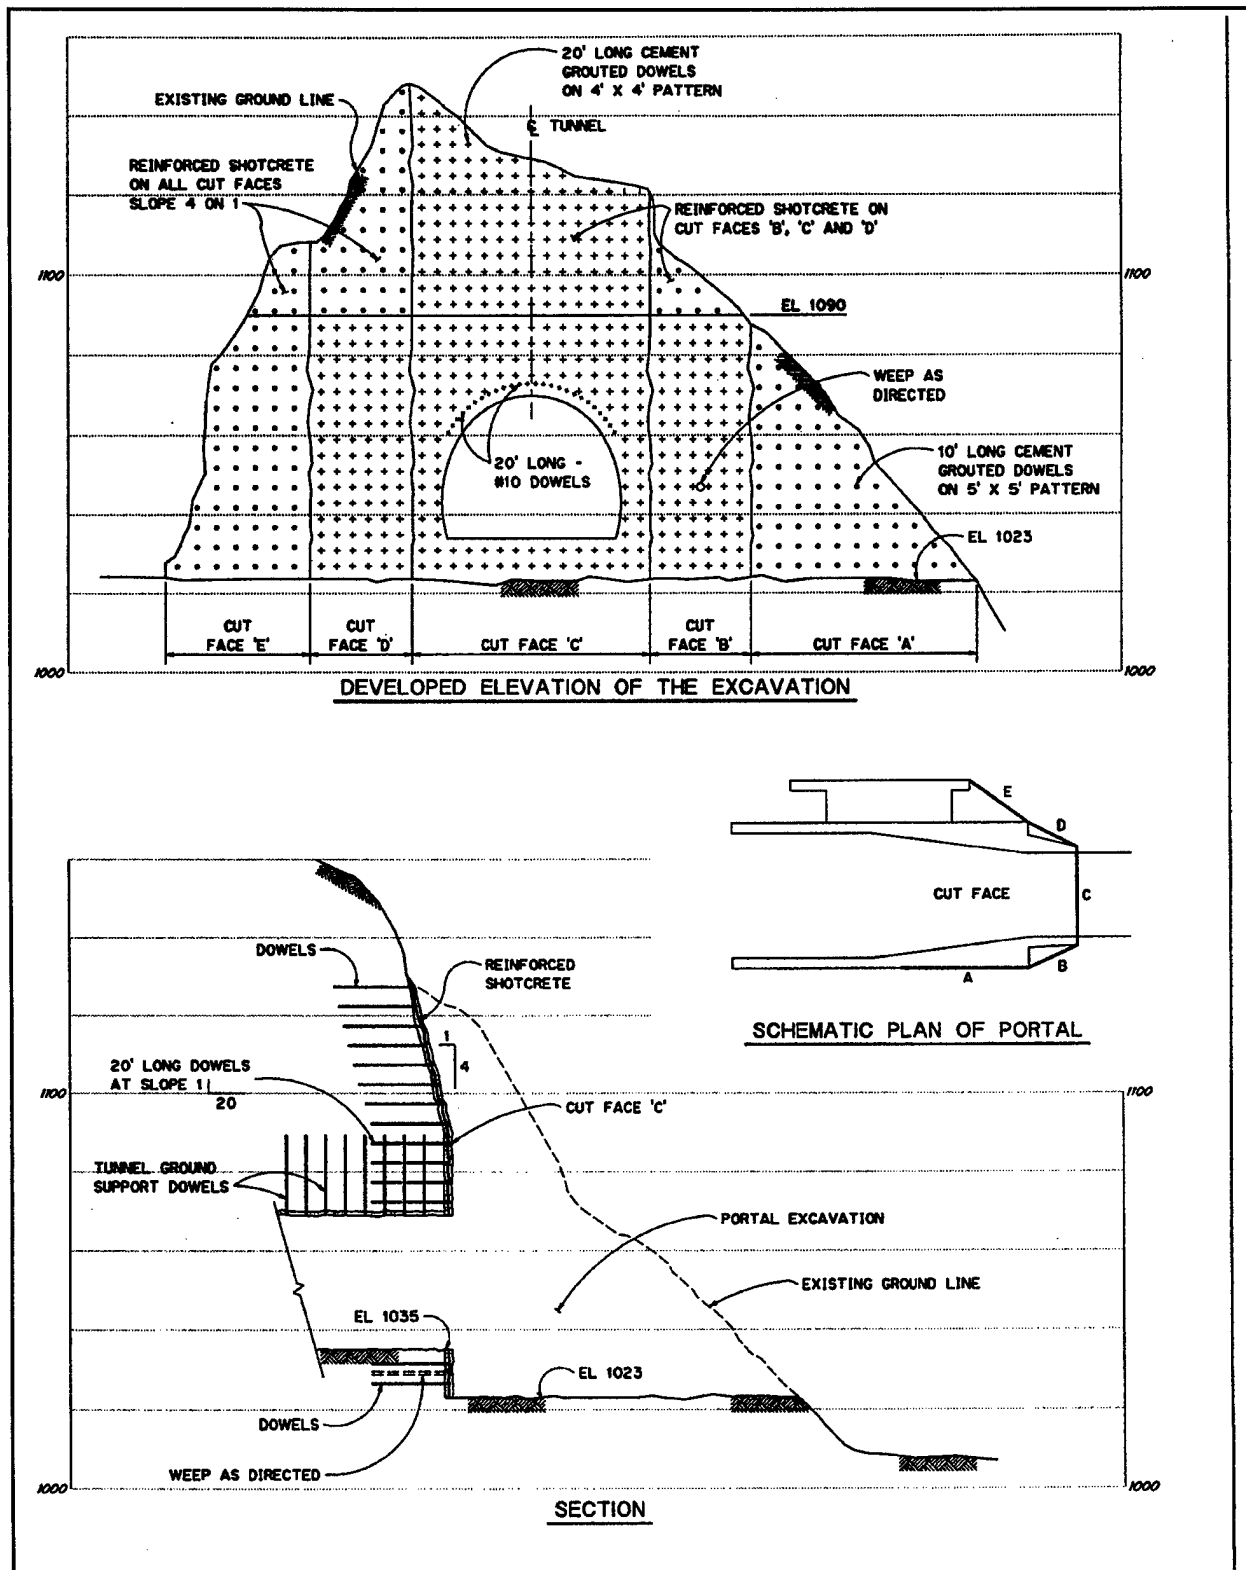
Portal excavation and support (H-3 tunnel, Oahu)
